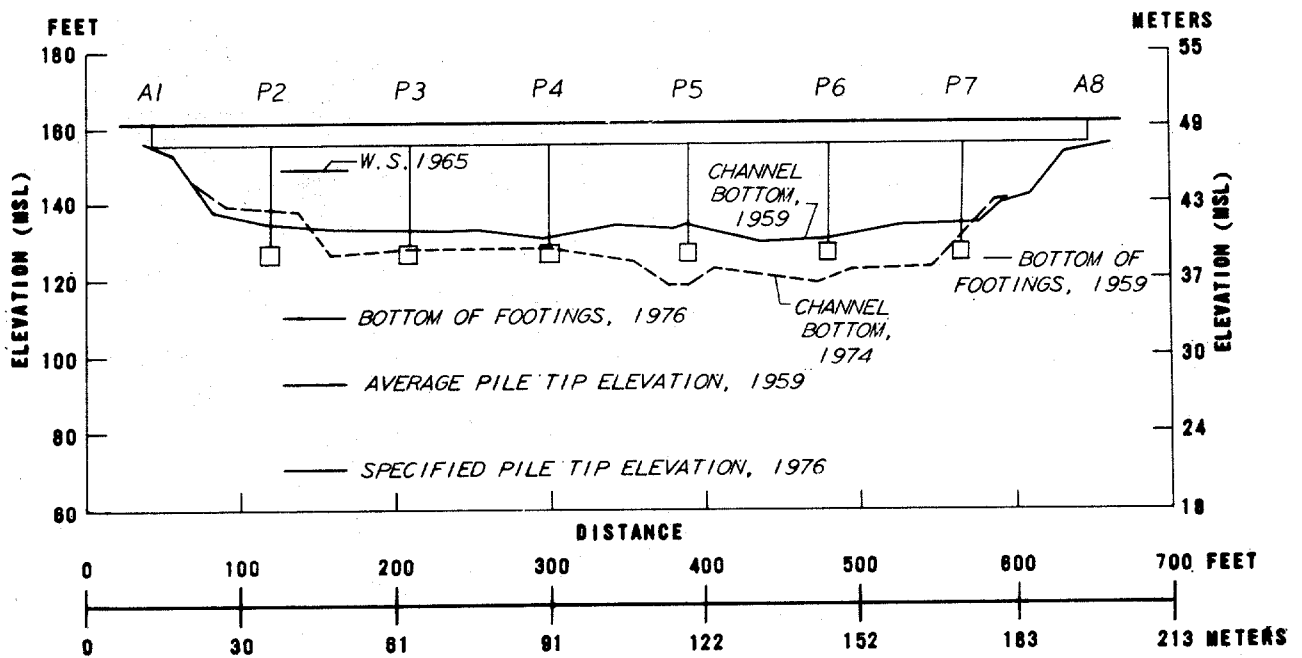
Cross section of Cache Creek channel at I-505 crossing.
